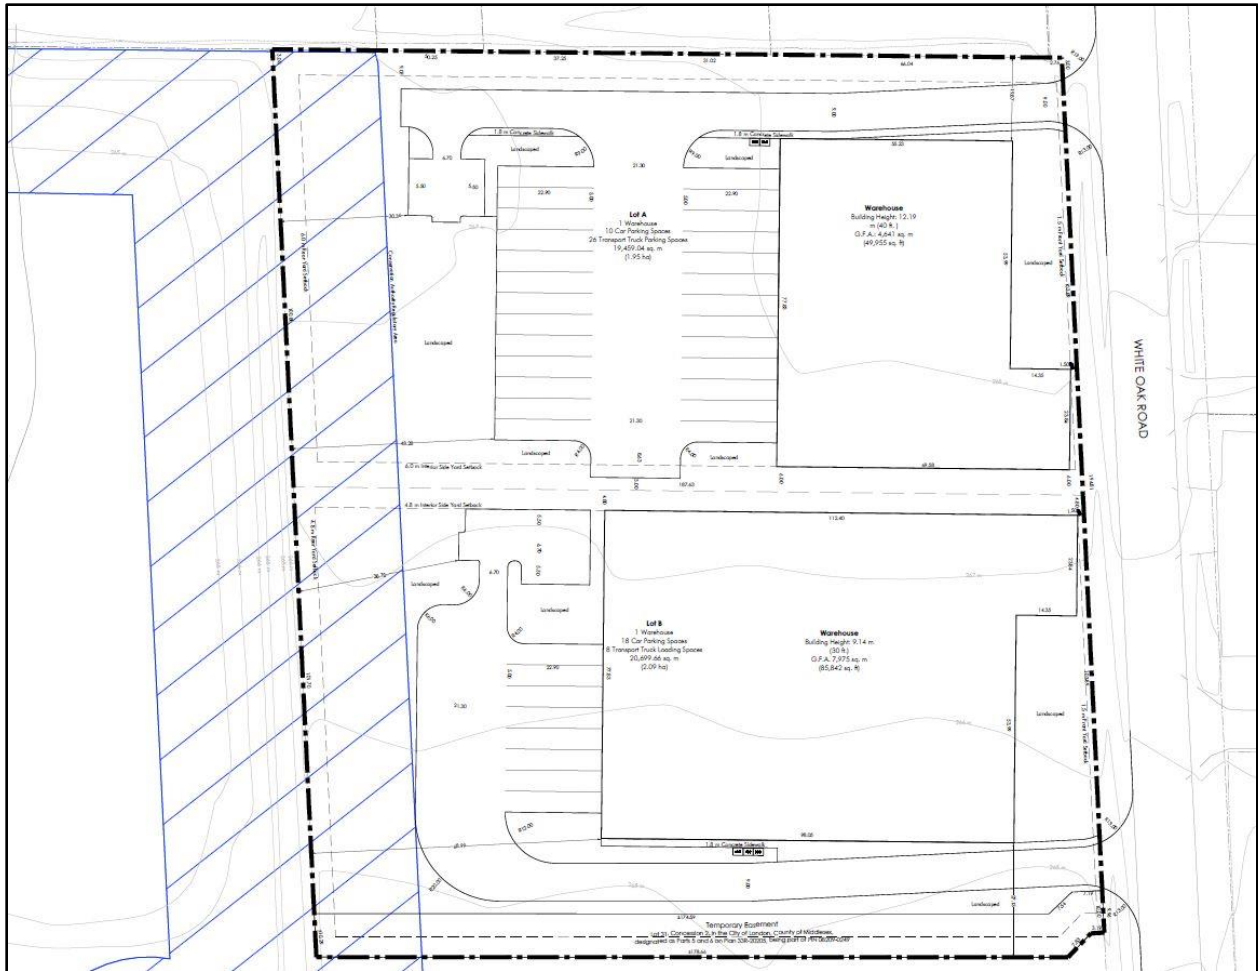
Conceptual Site Plan (Received June 20, 2023)
